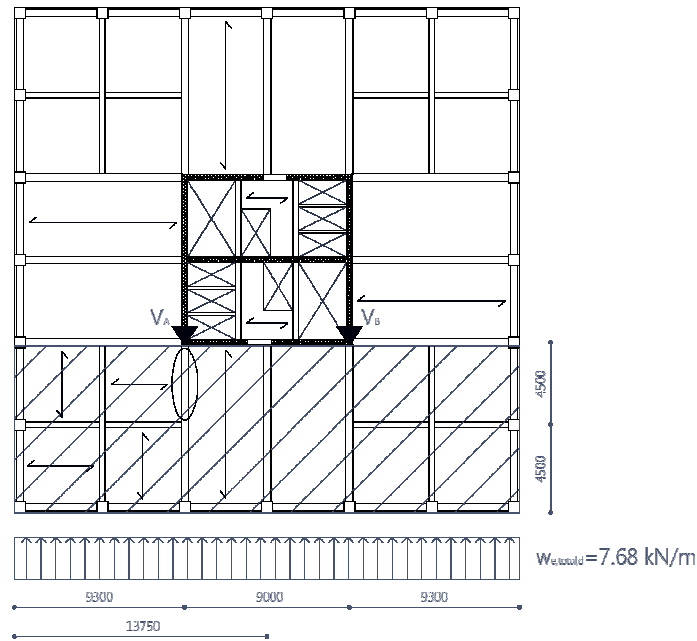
; Floor structure of single storey subjected to lateral wind loading
